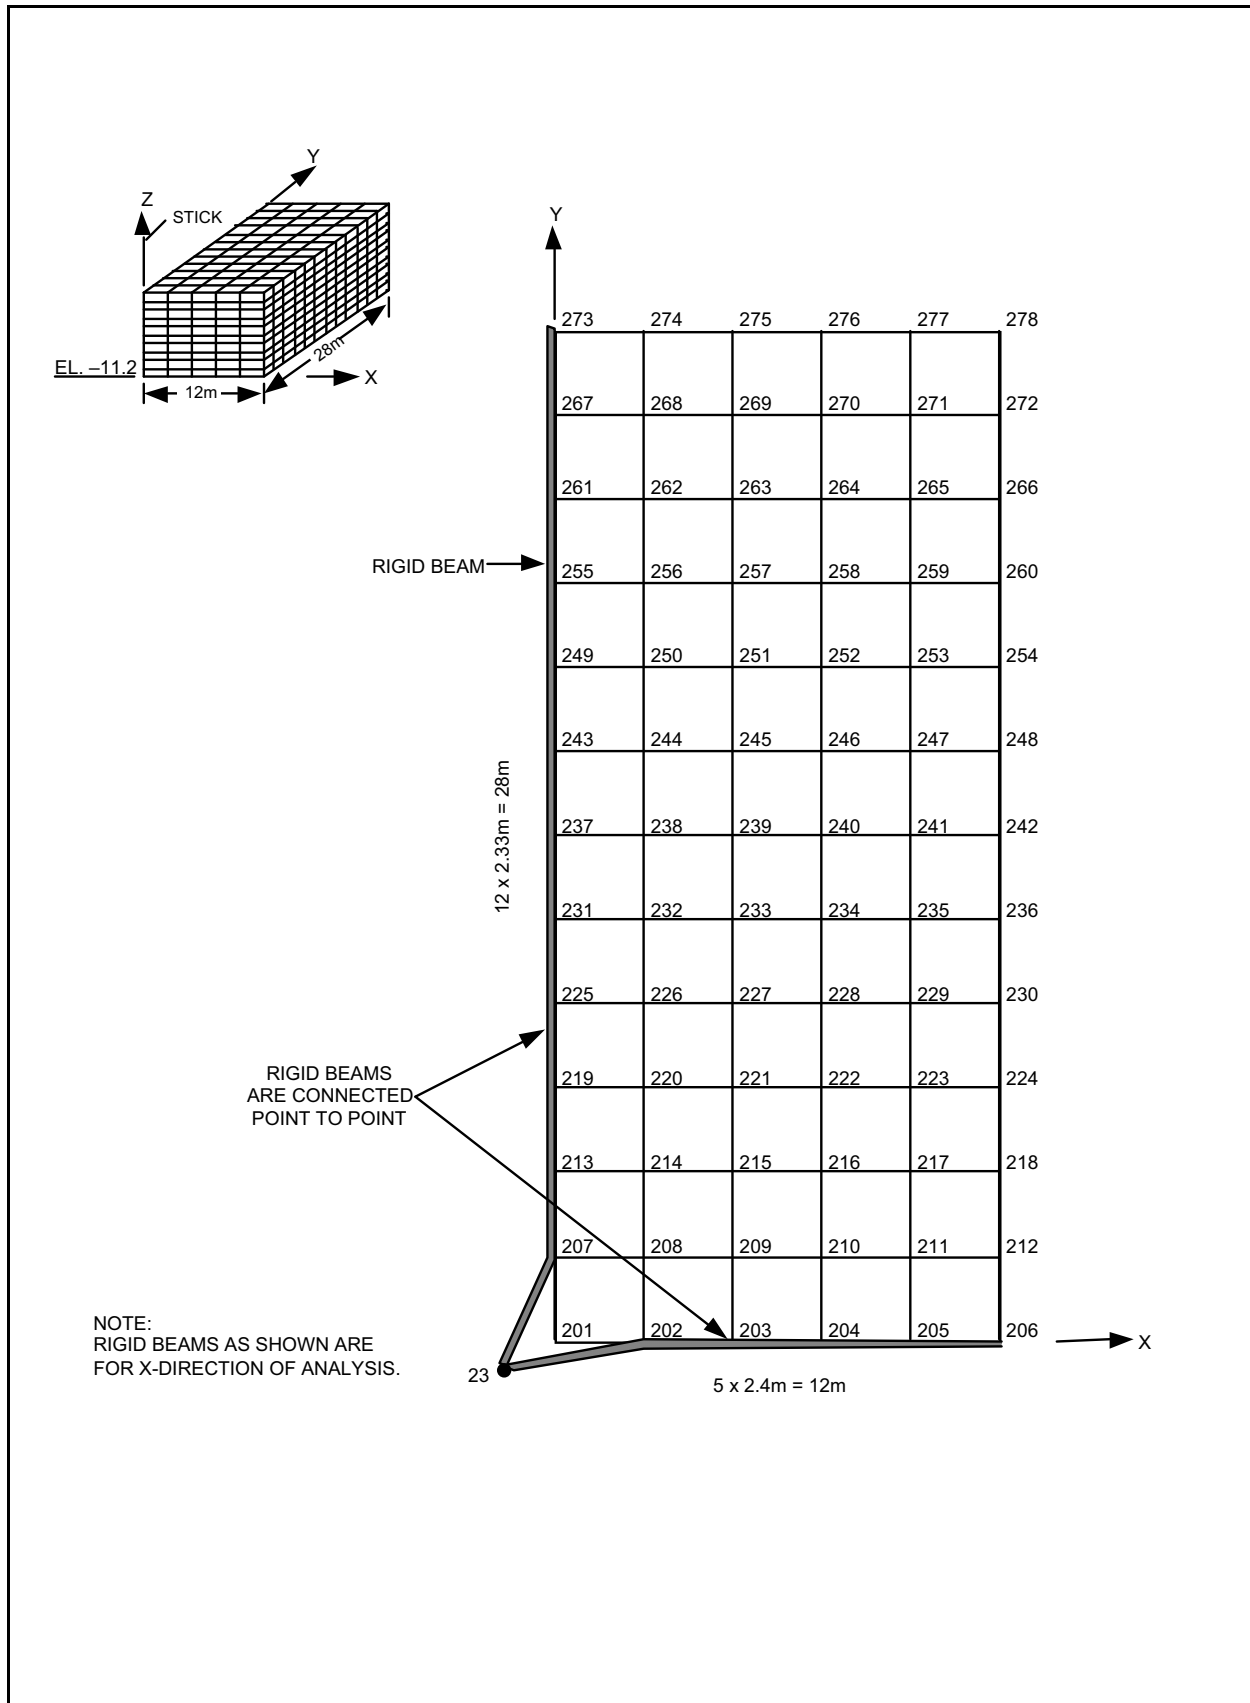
A-33 UB Case: Nodal Points at Elevation -11.20m
